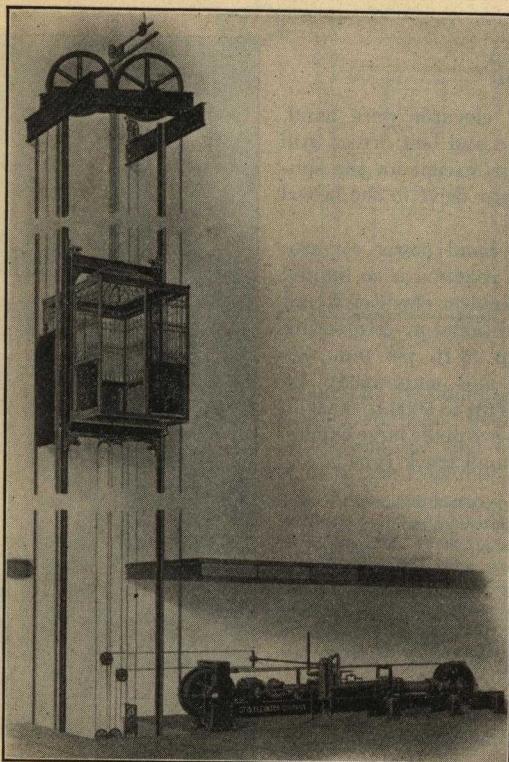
Rope geared hydraulic elevator—horizontal type.
